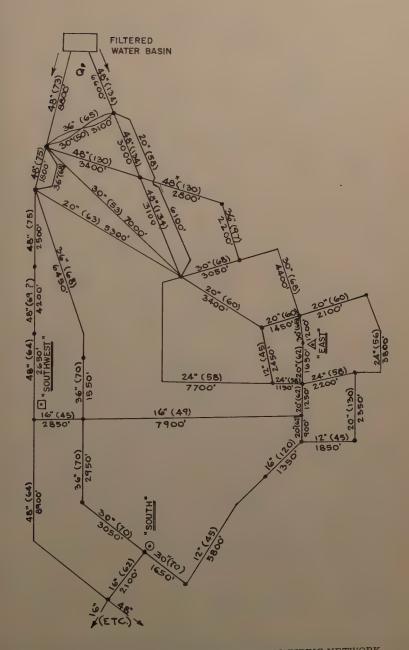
BELMONT GRAVITY DISTRICT, ARTERIAL PIPING NETWORK FOR "EXISTING" STUDY, NOT TO SCALE, SEE FIG. 4
